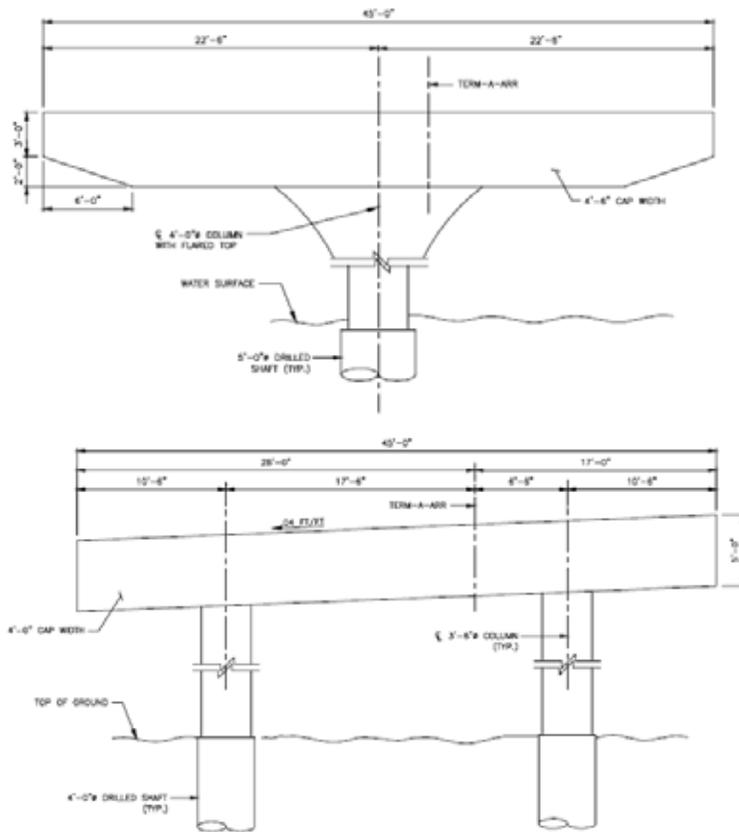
Conceptual Bridge Pier Elevations with Drilled Shaft Foundation
